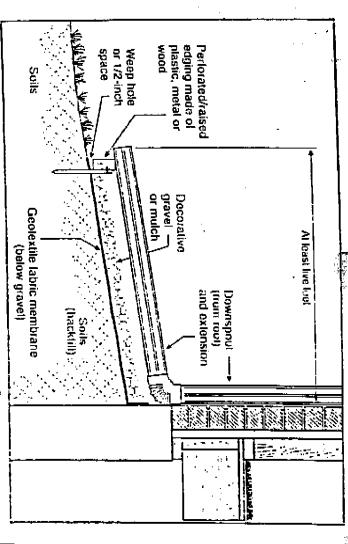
Properly designed runoff slope next to a house foundation. Note that raof drainage is carried by a downspout extension to a point beyond the slope. (From Holtx and Hart, 1978.)
